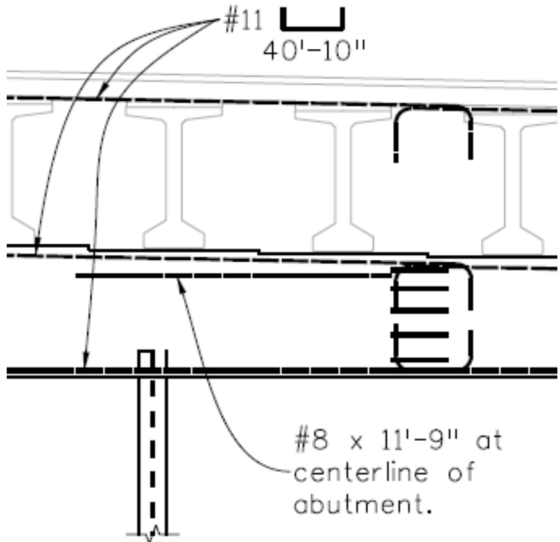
Example 1: Rebar not controlled by concrete dimensions
